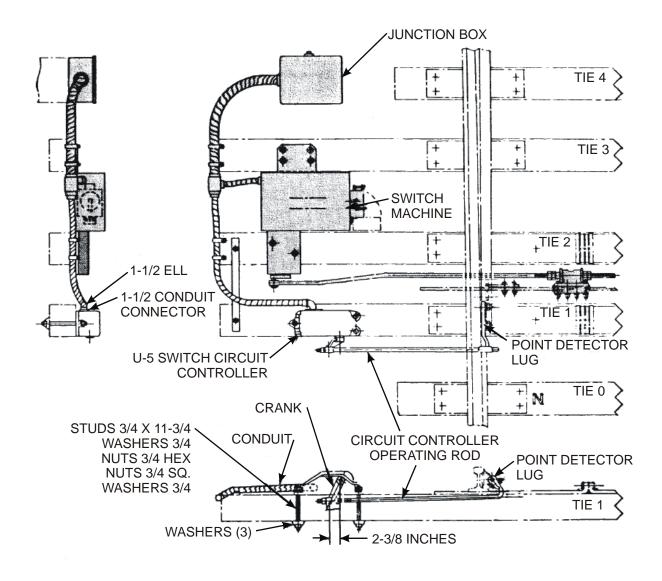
Typical Installation for Left-Hand, Near-Point Layout
